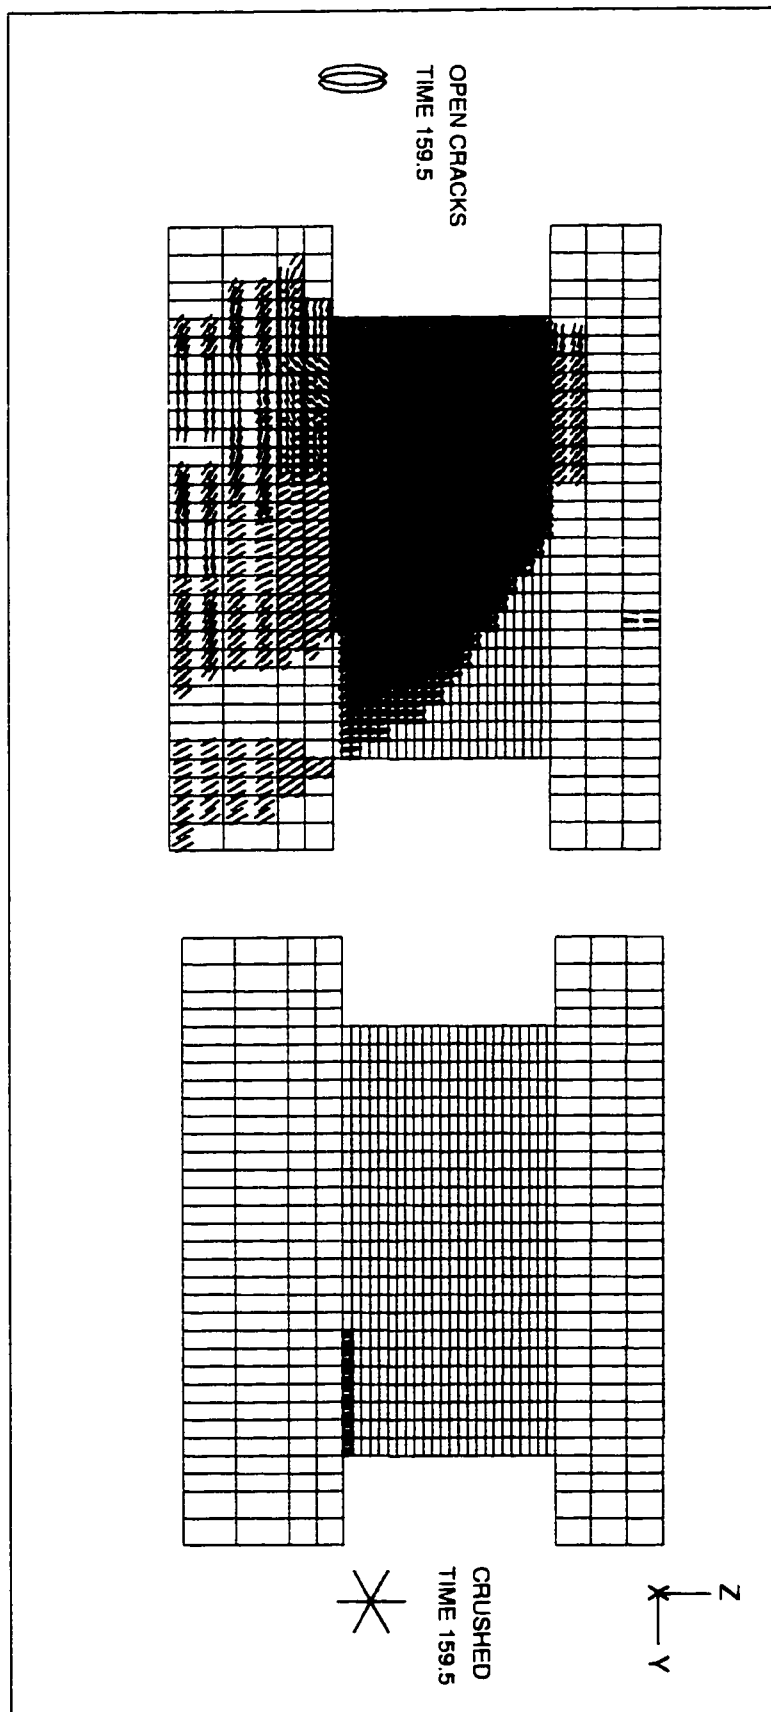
Cracking and crushing pattern of shear wall N17
